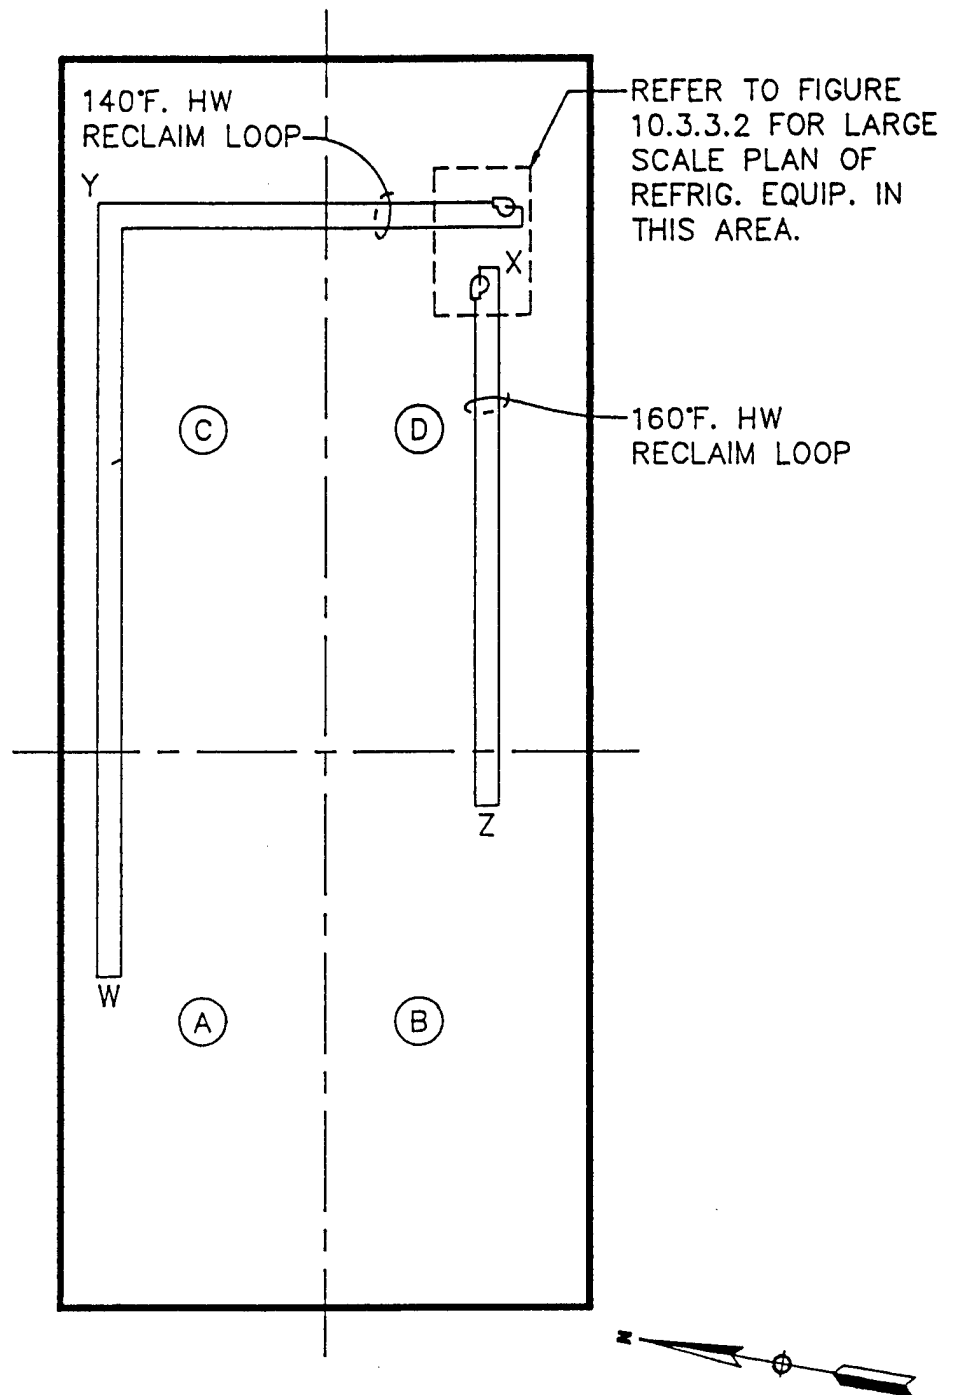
COMMISSARY & RECLAIM LOOP PIPING LAYOUT
